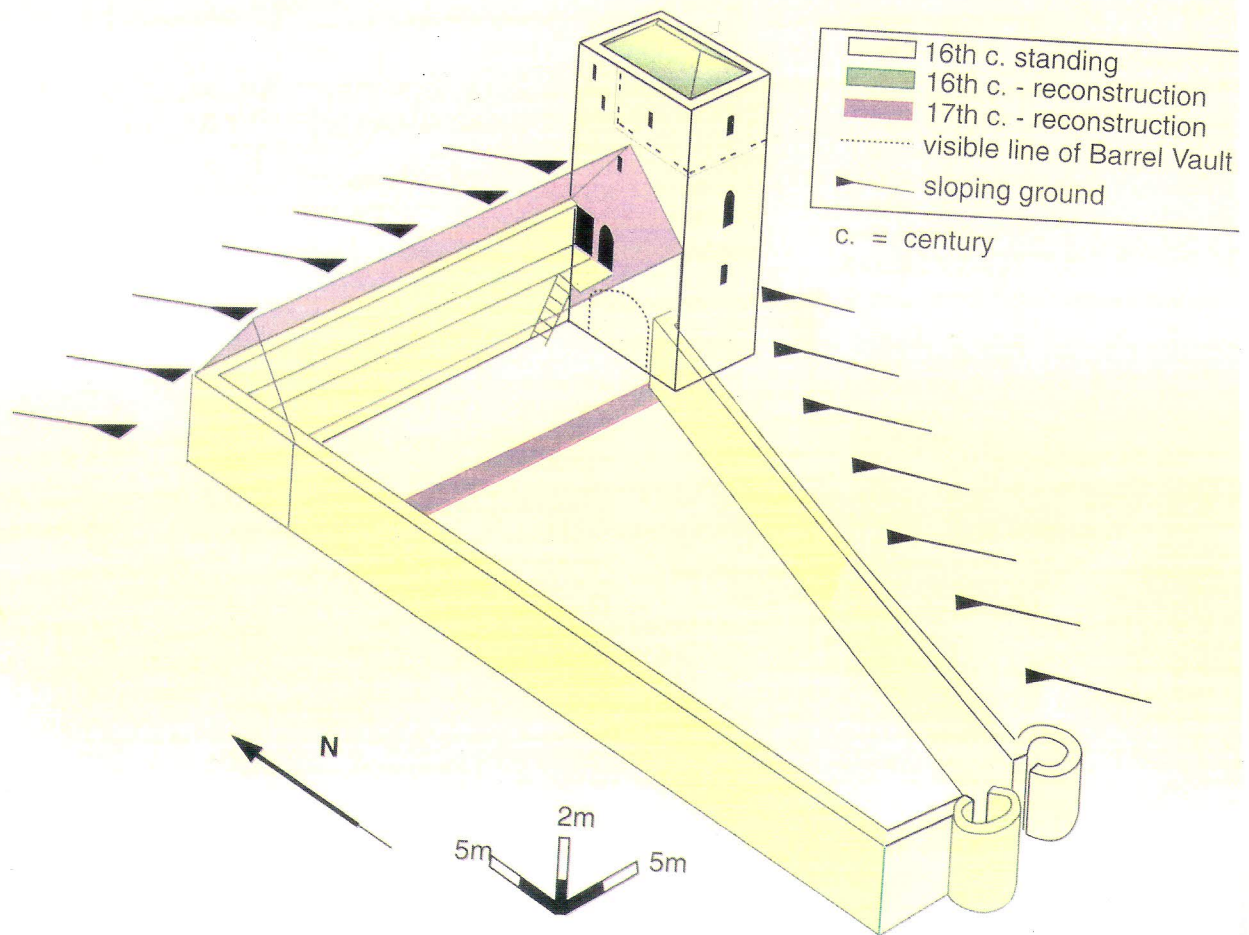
Reconstruction drawing of the Tower House at Oldcourt
